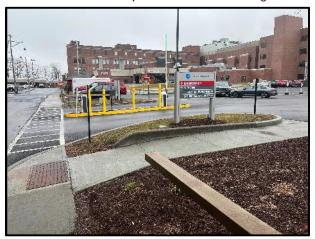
Crosswalk crossing School St. at the intersection with Park St.
